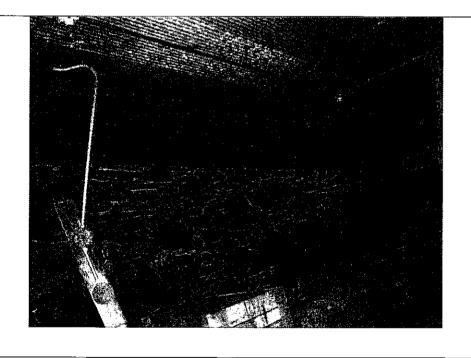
04/27/05 - Sanders Building (Building #3): Attic east section used as storage.
